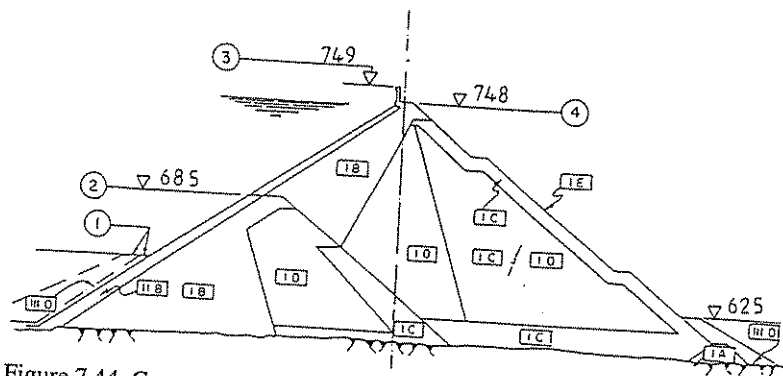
Concrete face rockfill dam. Zoning of Foz do Areia dam (elevations m a.s.l., adapted from Pinto et al. 1982).
